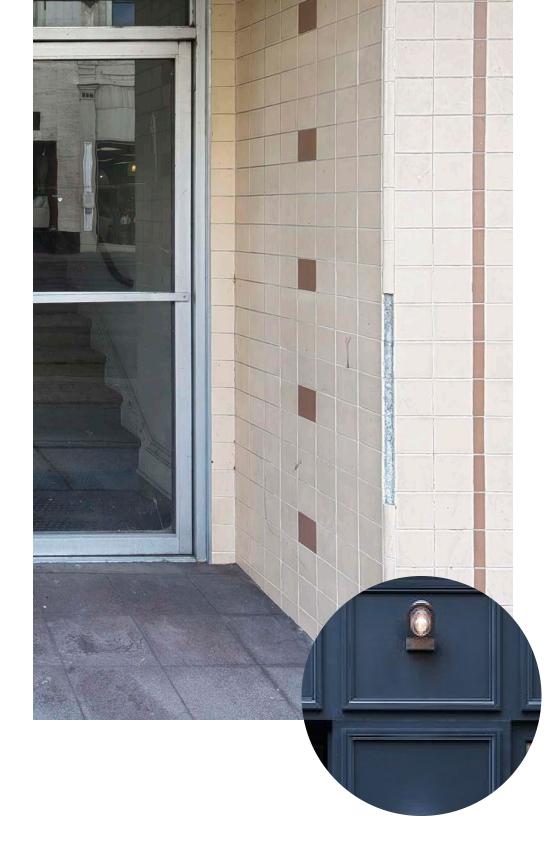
Exhibit C - storefront immediately west of main entrance on 2nd St: Damaged tile facade - to be replaced with black subway tile
